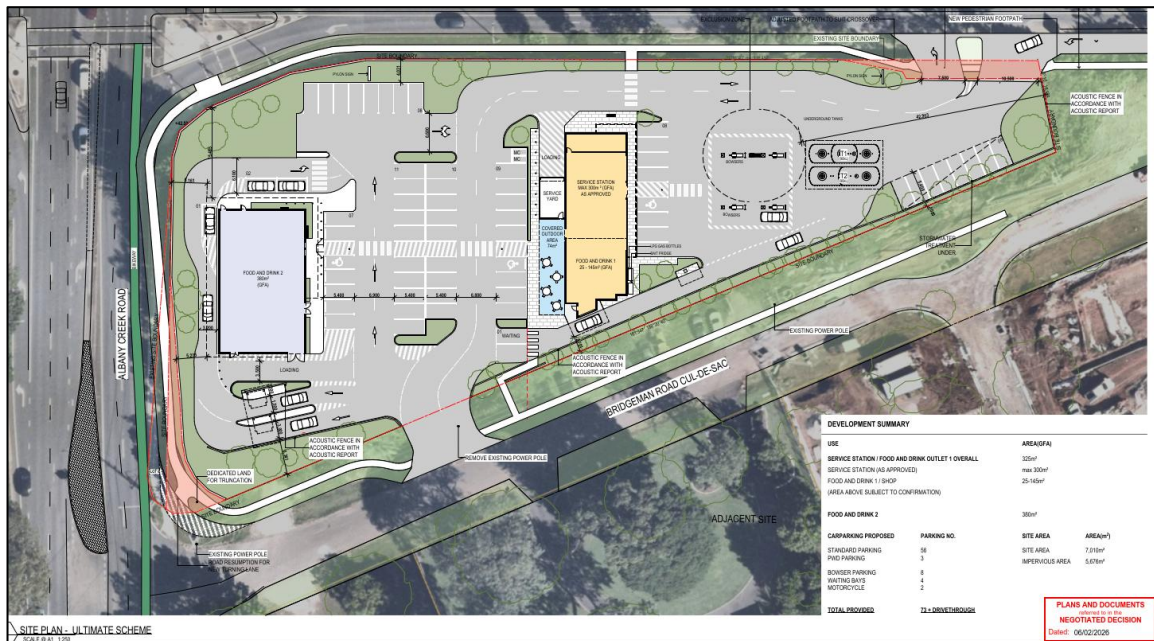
Extract of Approved Site Plan (SD1003, Rev 4)
